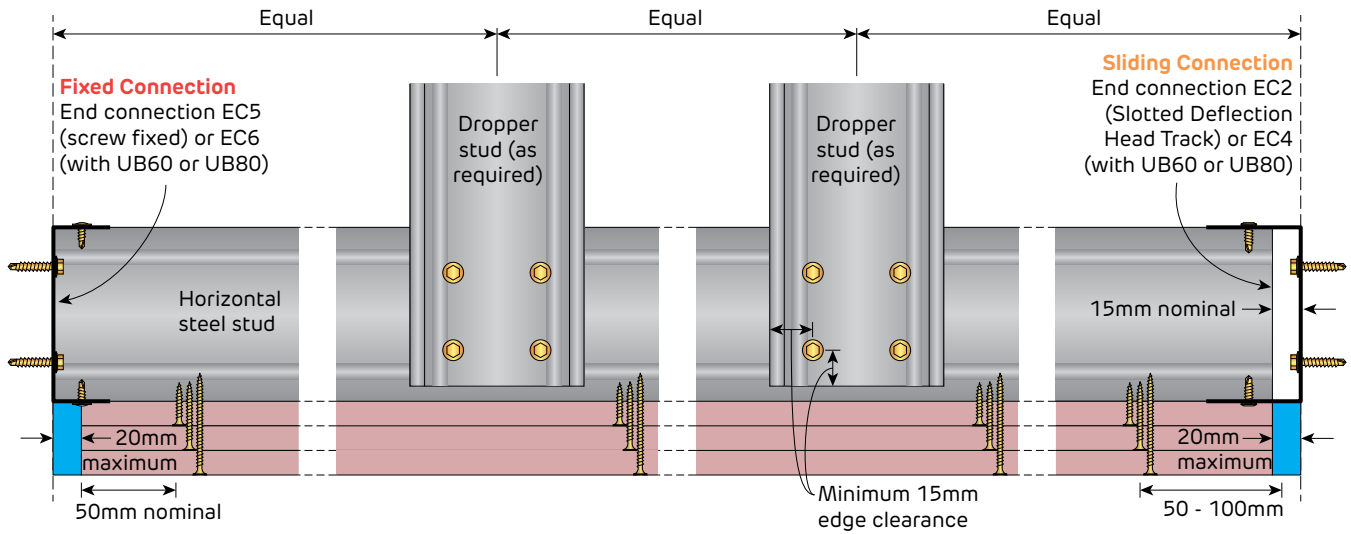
Stud Ceiling Type A2 - Fixed / Sliding
